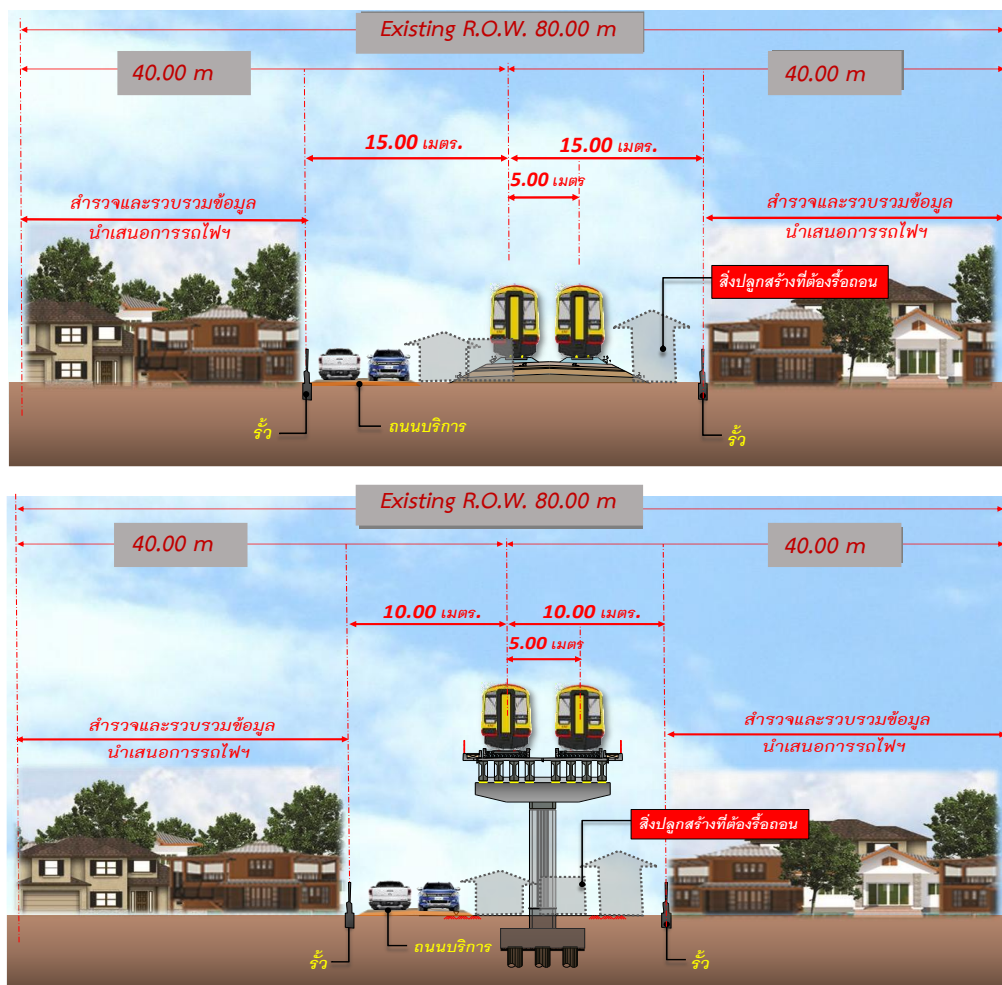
Typical cross section of Hat Yai Junction-Songkhla section
